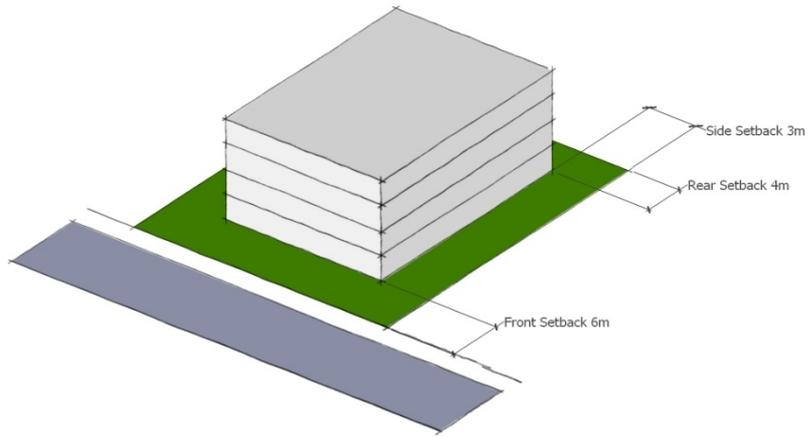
c – Setbacks – 3 or 4 storey Multiple dwellings
